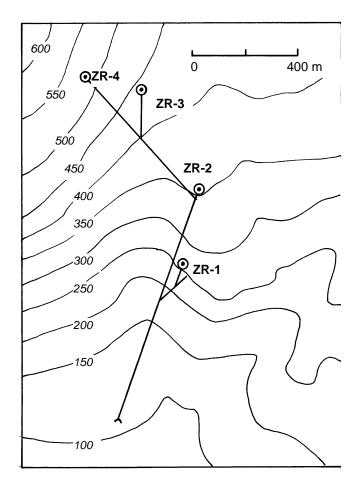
Plan of Tunnel A-37, northern Novaya Zemlya test site (Matochkin Shar).
